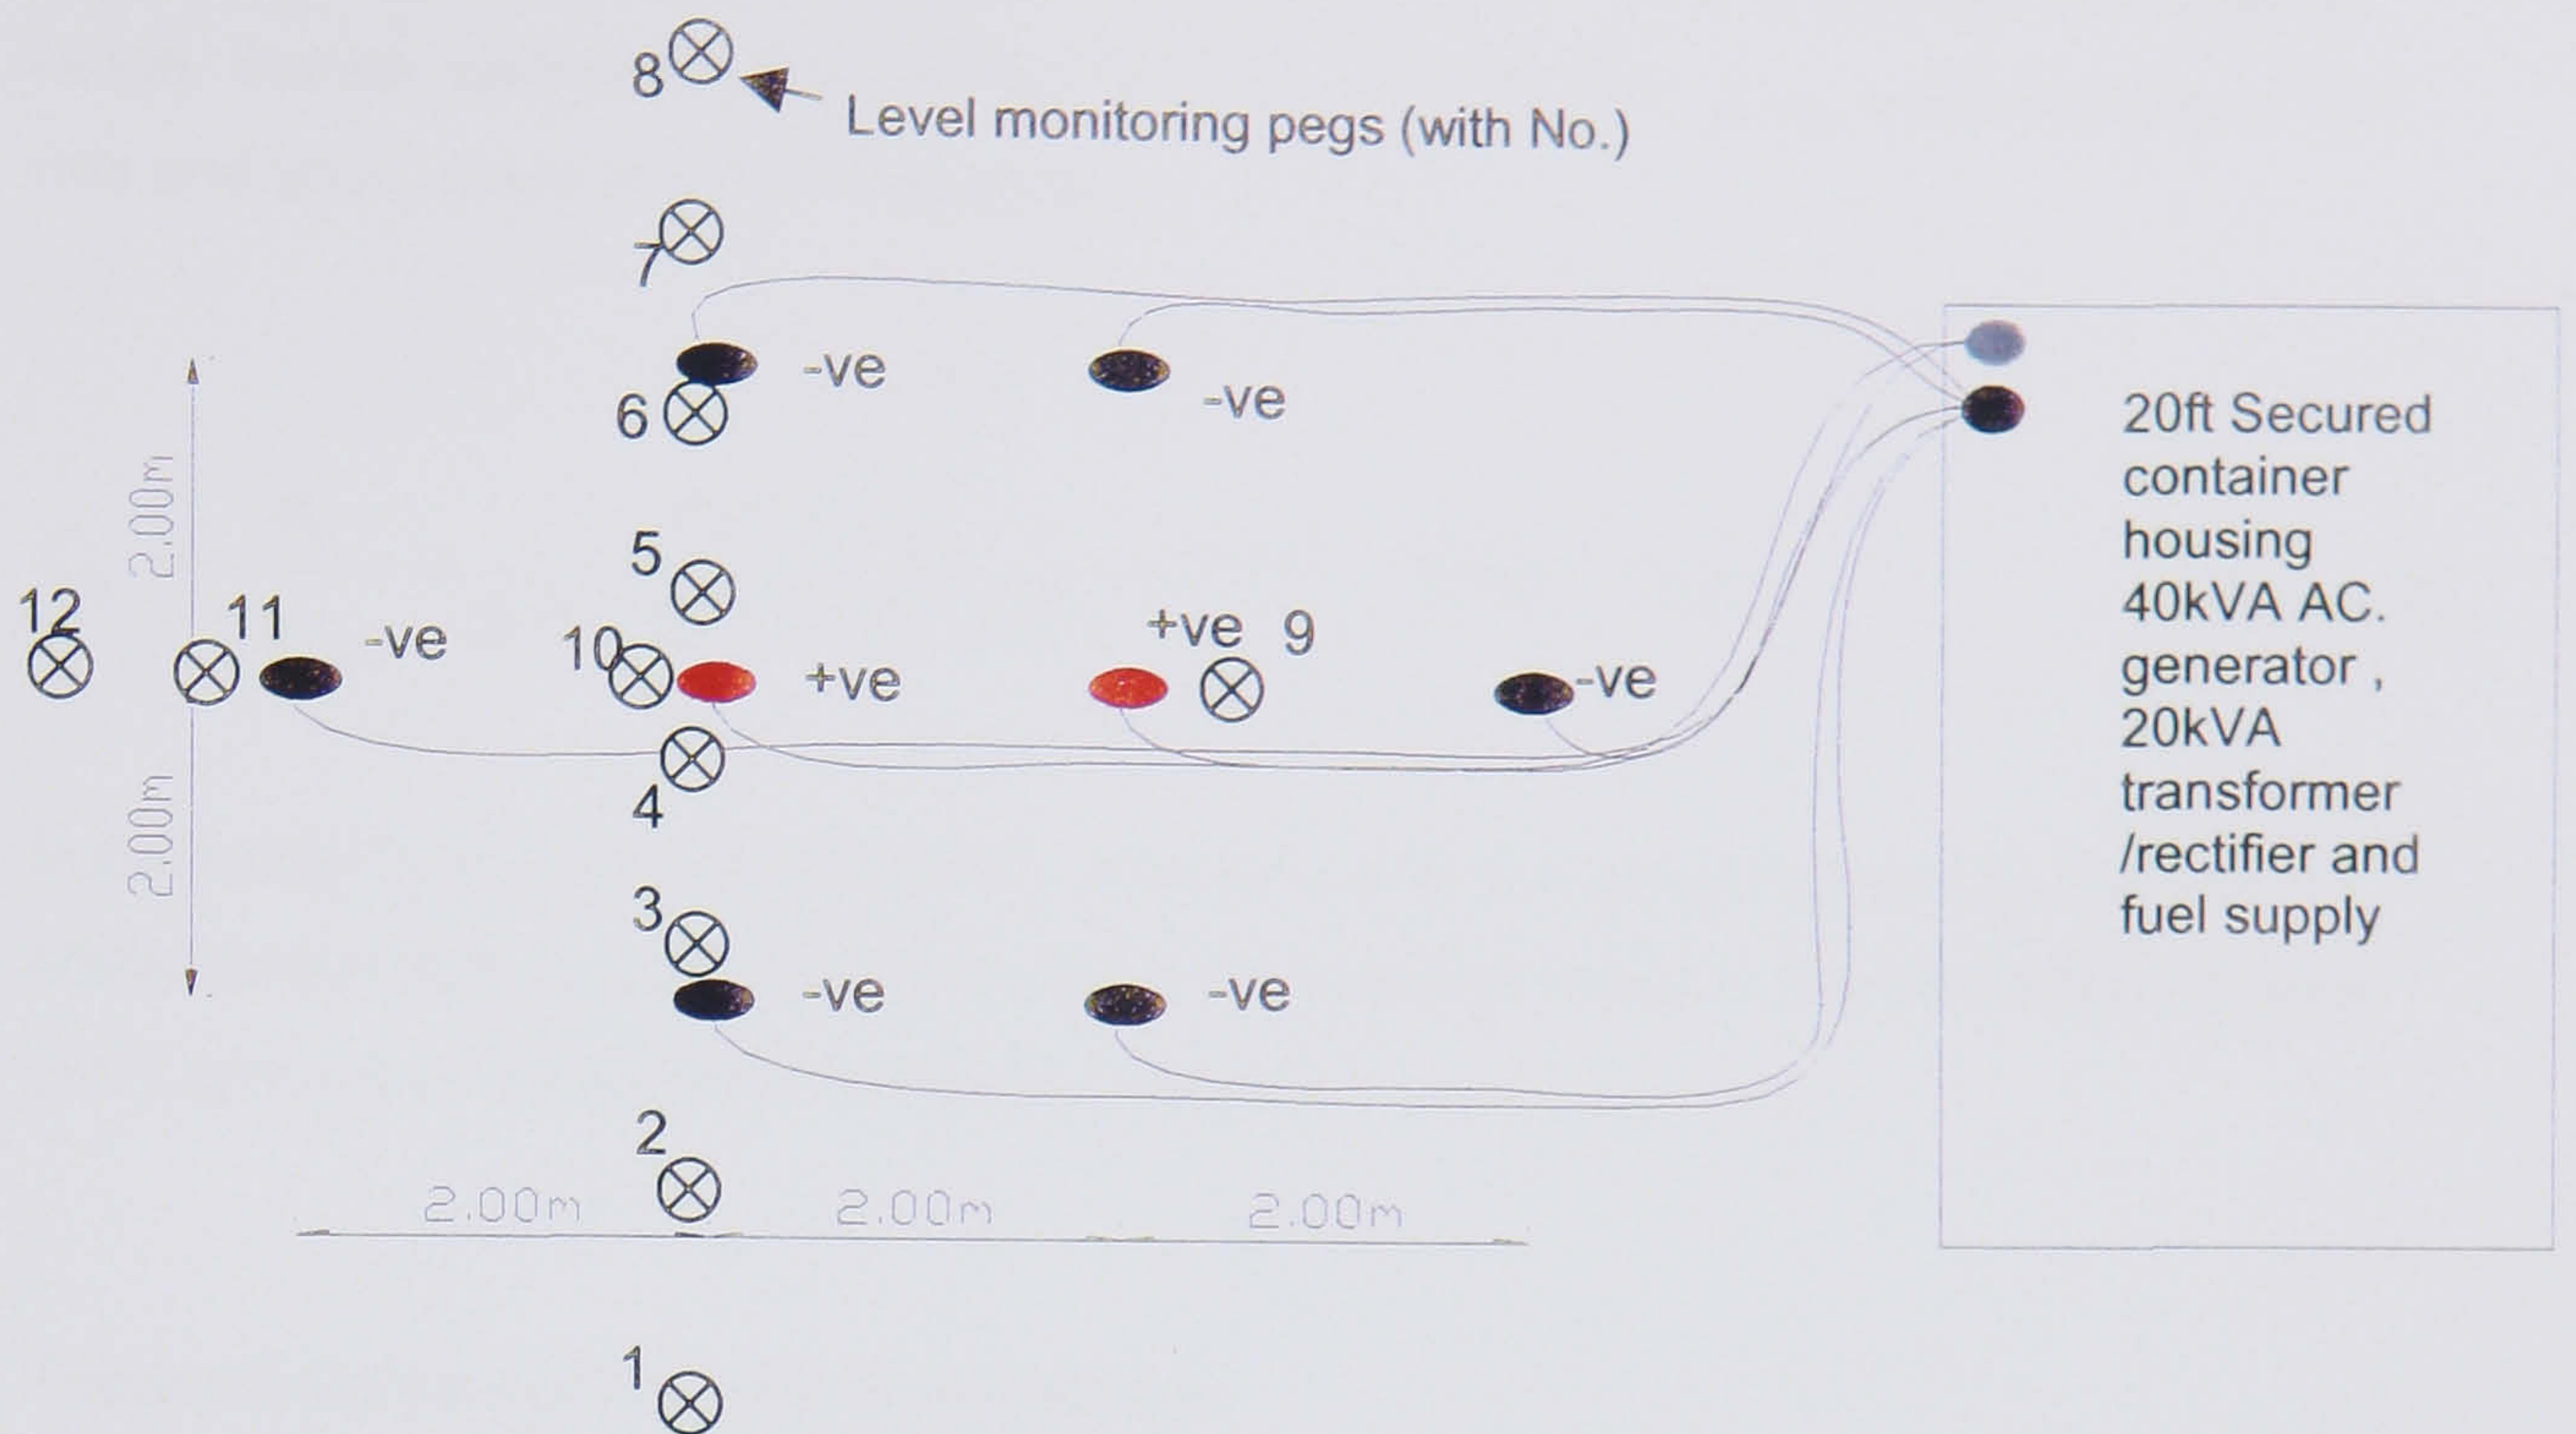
Electrode arrangement and surface monitoring peg layout
